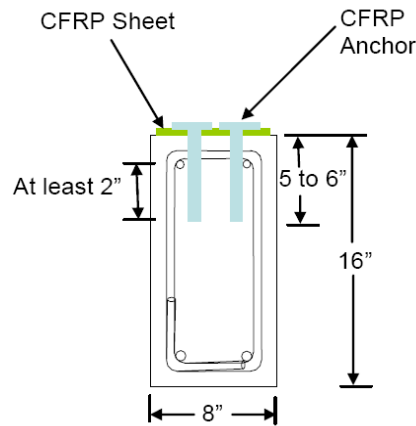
Depth of CFRP anchor [Orton et al. 2007]
